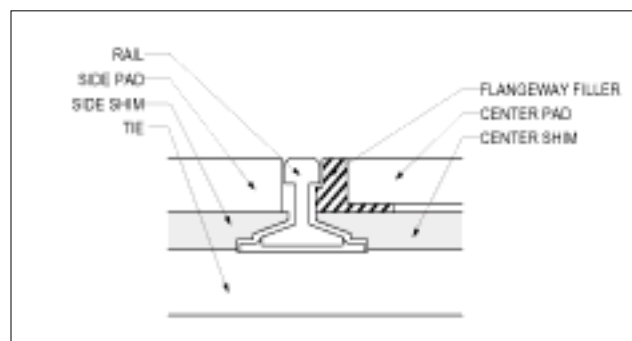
Bicycle-compatible railroad crossing detail, including flangeway fillers, are shown above.
